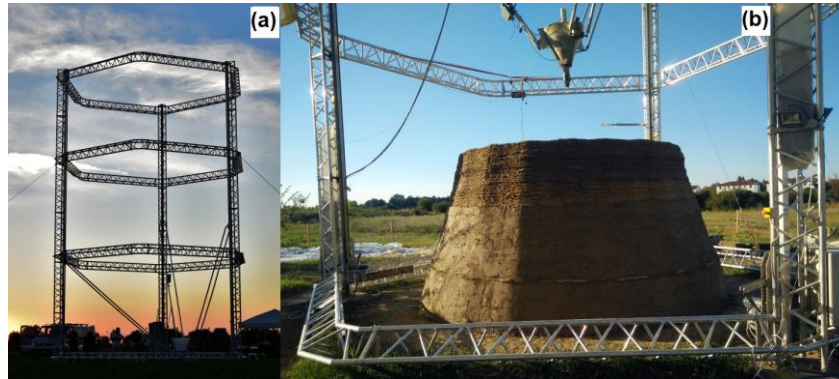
(a) BigDelta machine by WASP and (b) 3D printed structure [27]
